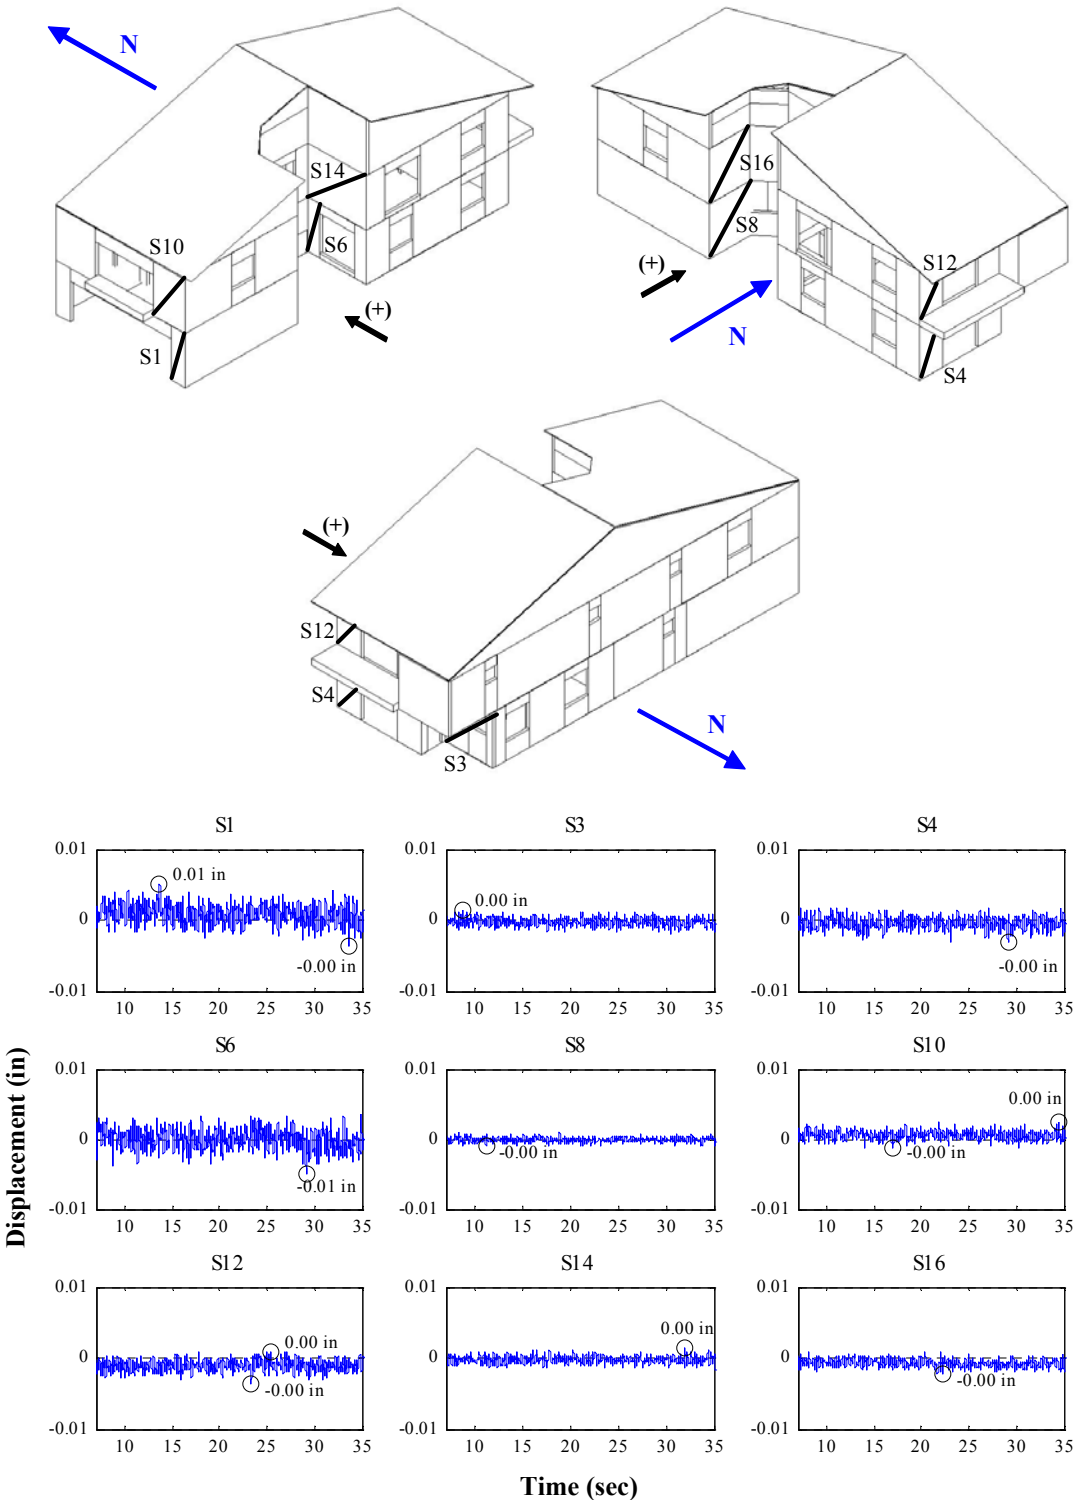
Wall deformations of north-south external walls for Test NWP3S02
